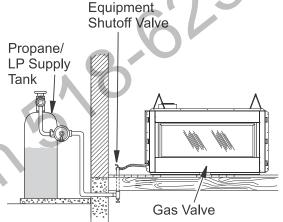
Checking Gas Joints for Propane/LP Gas Fireplace
